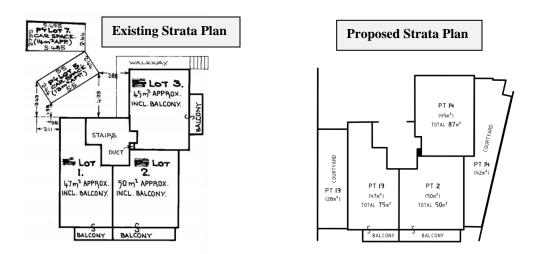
Comparison of the existing Strata plan (Ref No. 11195) & Draft Strata plan (Ref No. 18954) courtyards
